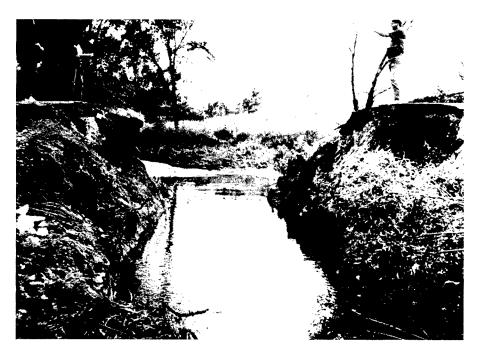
Culvert "washout" located on County Highway BB in Adair County, west of Kirksville, Missouri (courtesy of Missouri Highway and Transportation Department).
